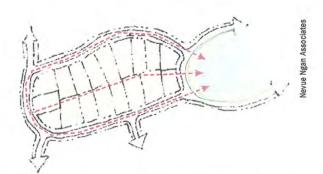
A conventional residential site plan. Stormwater is whisked away quickly via underground pipes into a large storage pond.
